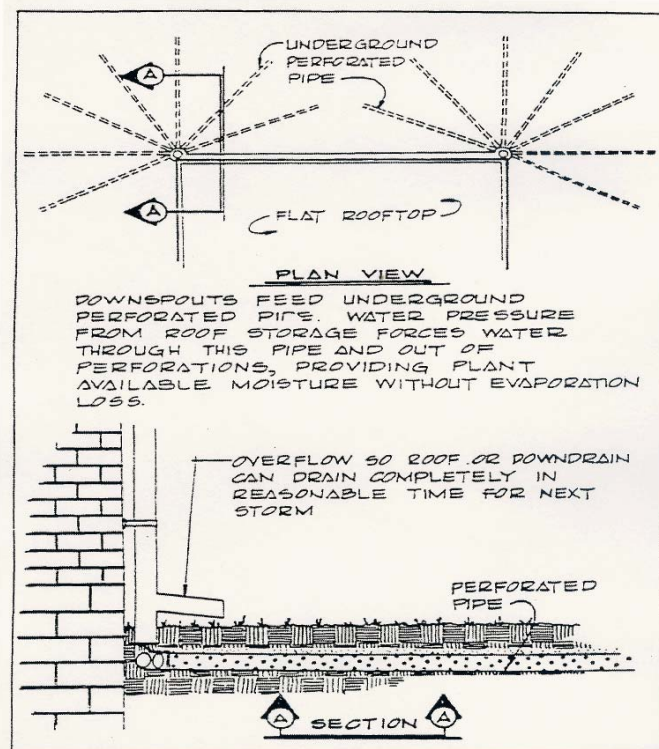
Downspout Connected to Infiltration Trenches Spread Out to Provide Underground Moisture to Lawn. Source: Baltimore SWM Manual
